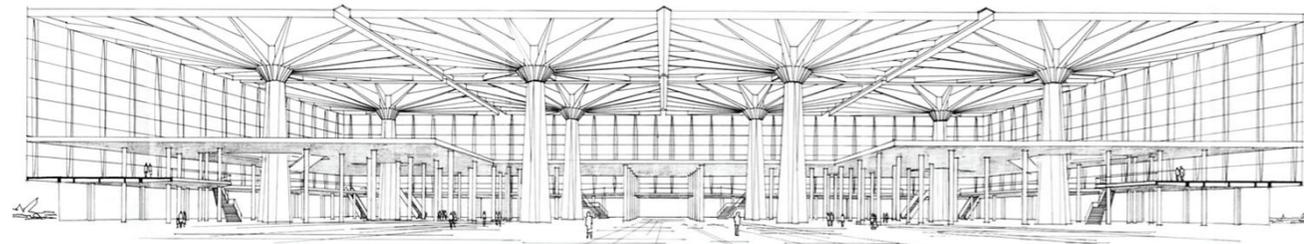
Palazzo del lavoro construction site. (Archivio Storico della Città di Torino).
